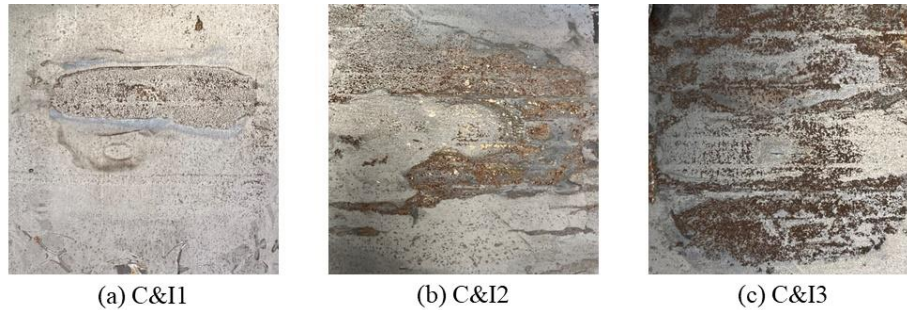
Visual inspection of specimens after rust removal.
